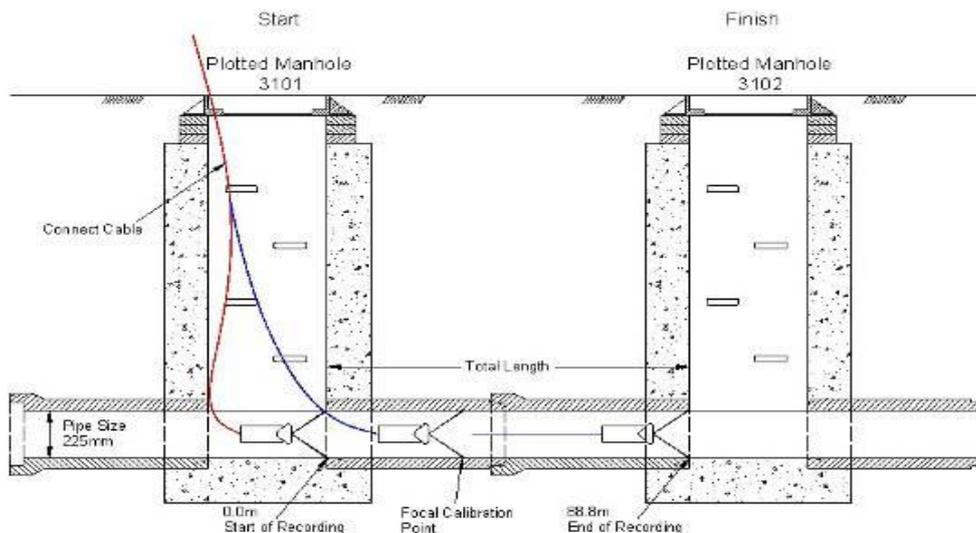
Chainage recorded during inspection (From Manhole View)
